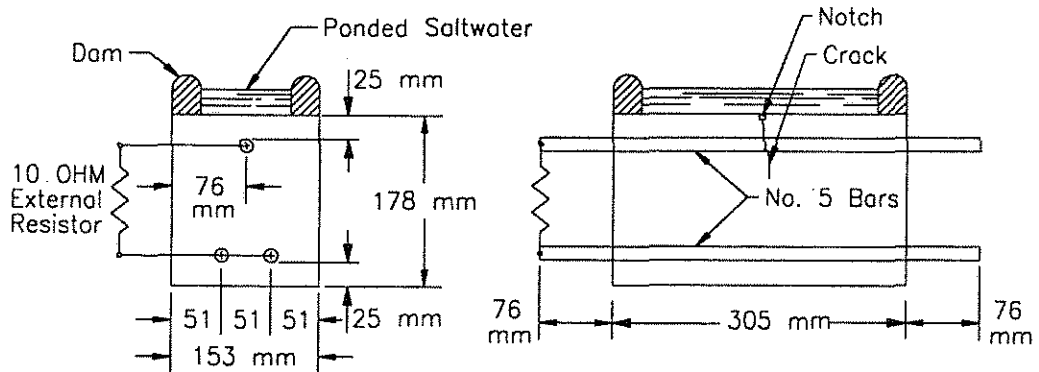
End and Side Views of the Cracked Beam Test Specimen
